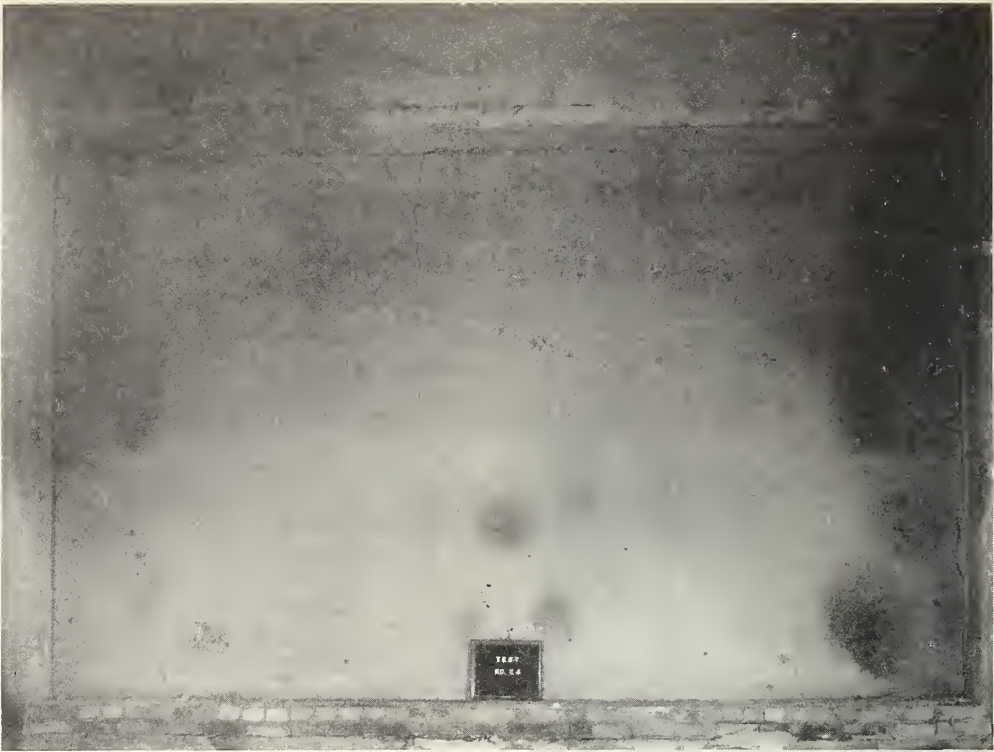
Fire-exposed face of an 8-in. unreinforced wall of Potomac River gravel concrete after 5½-hr test.
